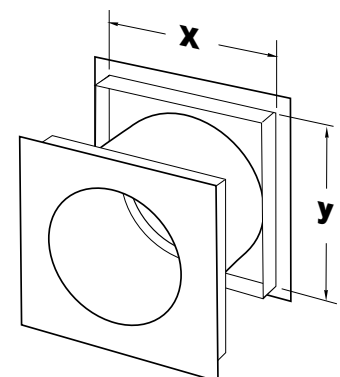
Wall cut-out specifications for direct vent wall thimbles may vary by manufacturer.
